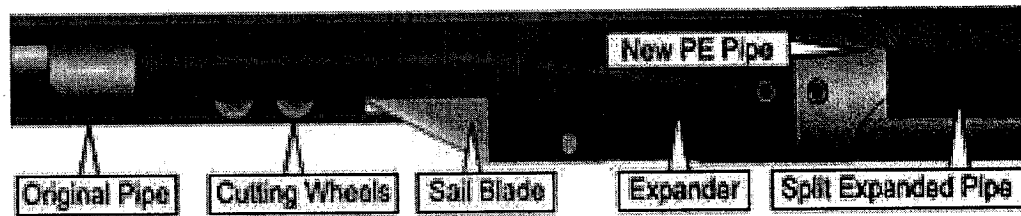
Pipe splitting system (UKSTT , 2005)
